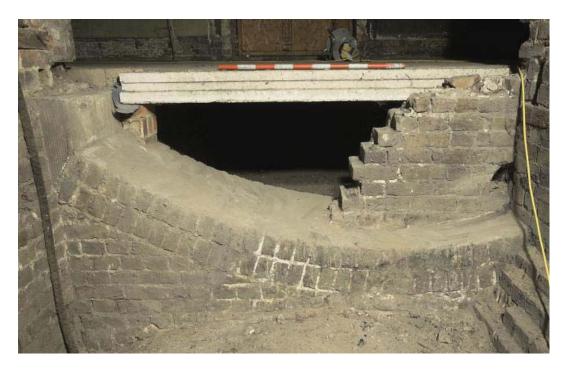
Central east-west wall and inverted segmental brick arch below the ground floor of Block 3 visible where the floor of the west staircase in Room CFO3G4 had been removed
